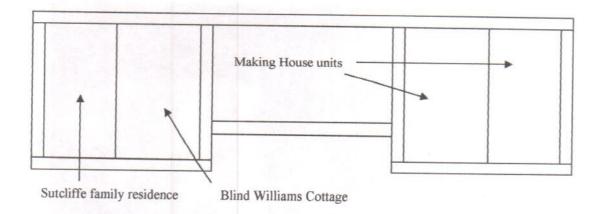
probable layout of second floor of Litt House. Only the northern wing shows: the southern wing was also 3 storeys, but the ground floor was a further storey down, due to the slope of the hill, and accessible from its southern side. The gatehouse would probably only have been two storeys, with the roof lines of the gatehouse and the southern wing being at the same level (see fig. 10c).
